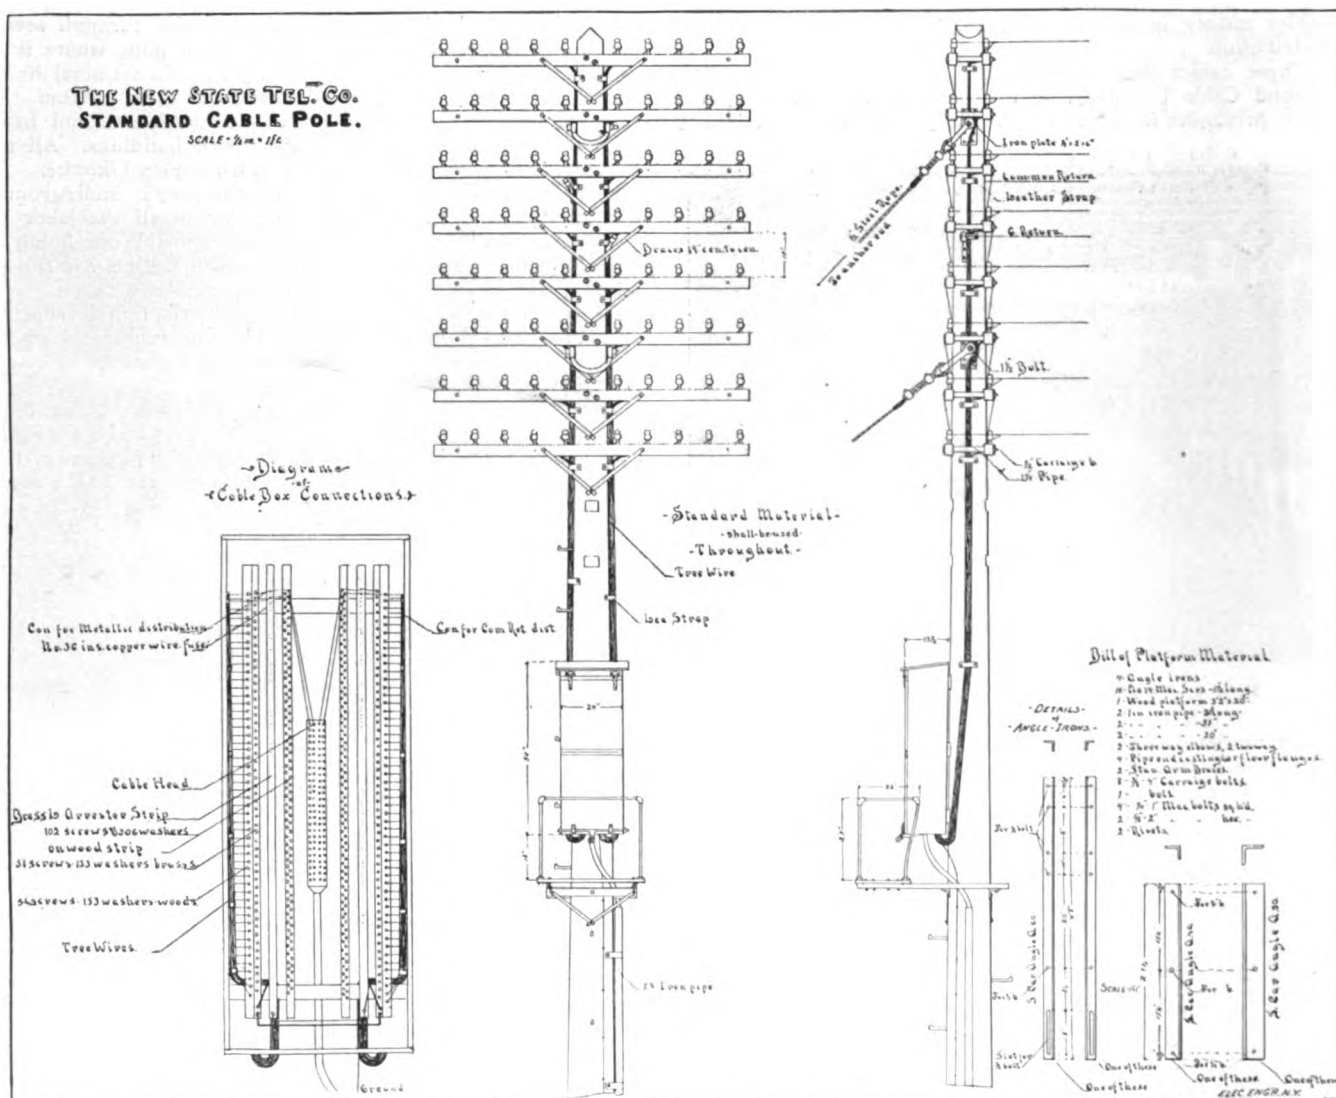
DETAILS OF POLE CONSTRUCTION AND DIAGRAM OF CABLE BOX CONNECTION.
